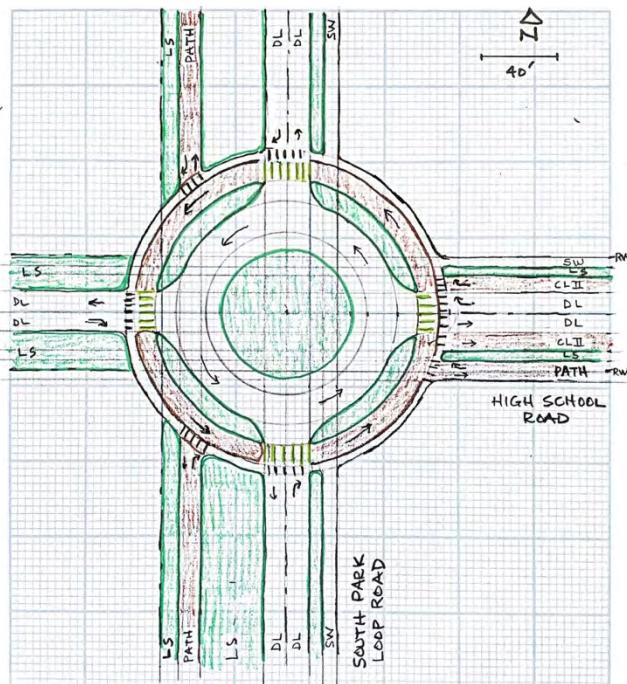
Conceptual roundabout plan for the intersection of High School Rd. and South Park Loop Rd.
